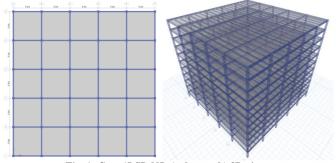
Case 1LSB-NS a) plan b) 3D view
